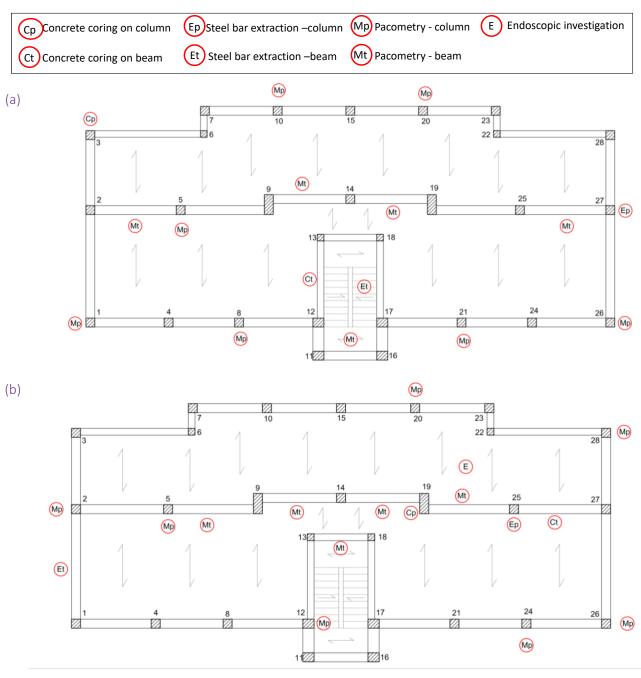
Survey plan – (a) First Floor, (b) Second floor.
